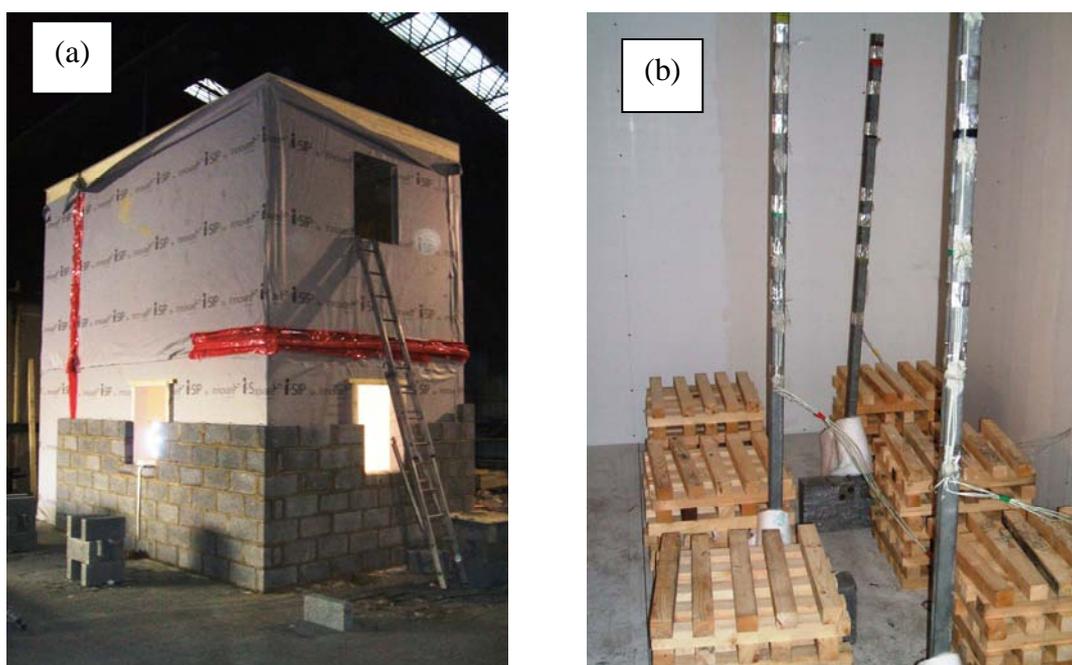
(a) Two storey SIP fire test building (b) inside compartment with fire loading
